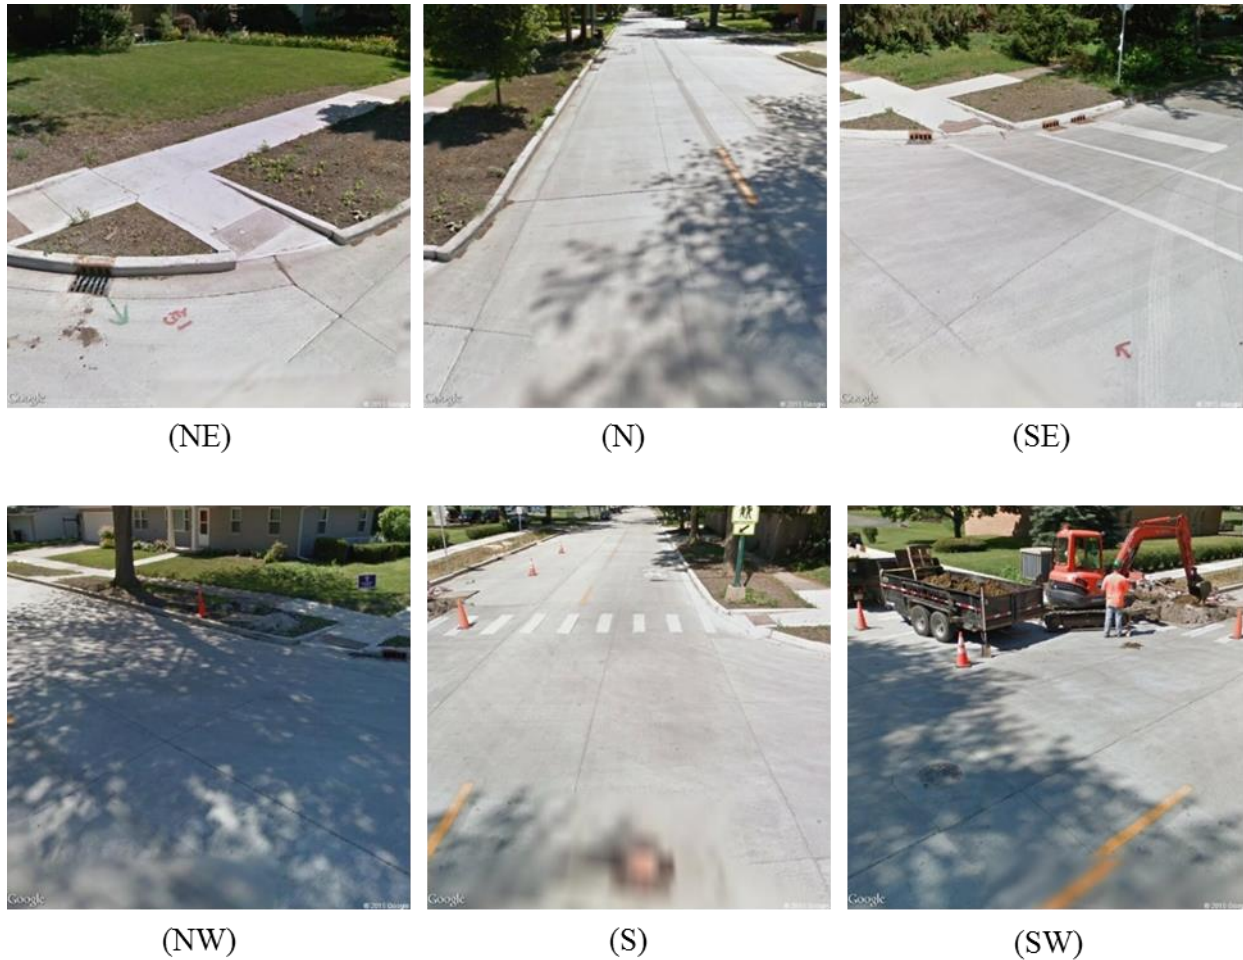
shows an example of six images downloaded at coordinates [40.10838625,-88.2502415] along South Elm Boulevard. South Elm Boulevard is a two-way road split into two one-lane, one-way roads moving, southbound and northbound. The two one-lane roads are separated by a significant median with garden features. Due to the narrow nature of these roads, the images oriented perpendicular to the roadway do not include the curb. This exclusion creates a gap in the data gathered. If a storm drain was located in this portion of curb, it would not be possible to detect it given the image data downloaded. The dead zone is also evident in these images and is close enough to the curb to potentially interfere with the identification of a drain.
